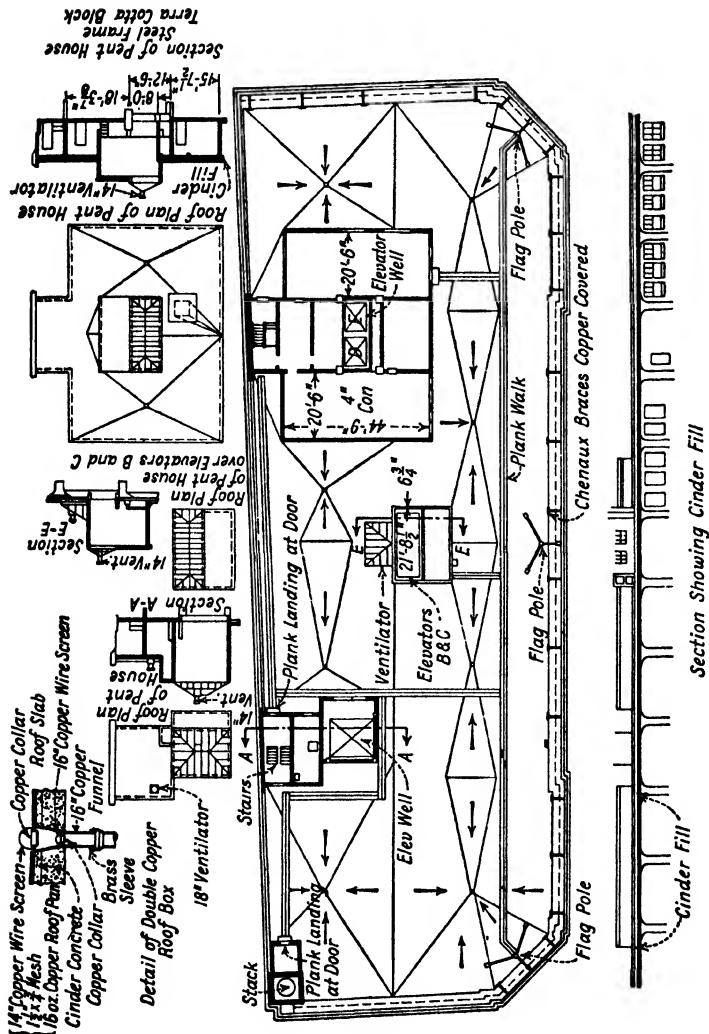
Roof Plan Paine Furniture Co. Building. (See p. 650.)
